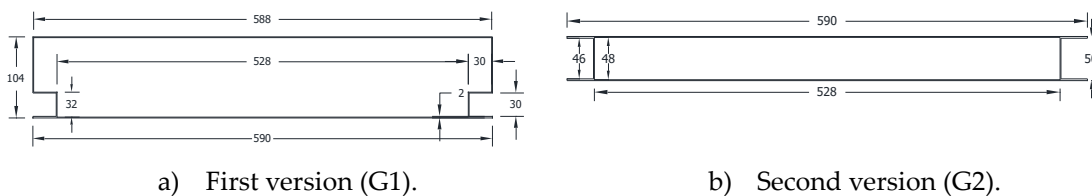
Water wall horizontal cross-section (*EcoSteelPanel*).
